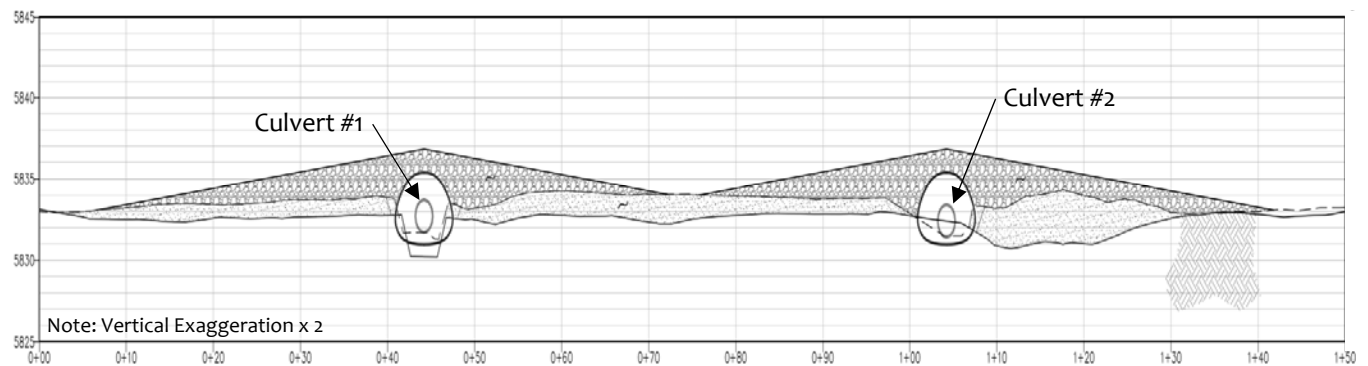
Culvert Replacement Alternative 1 – Large Culverts (2)
